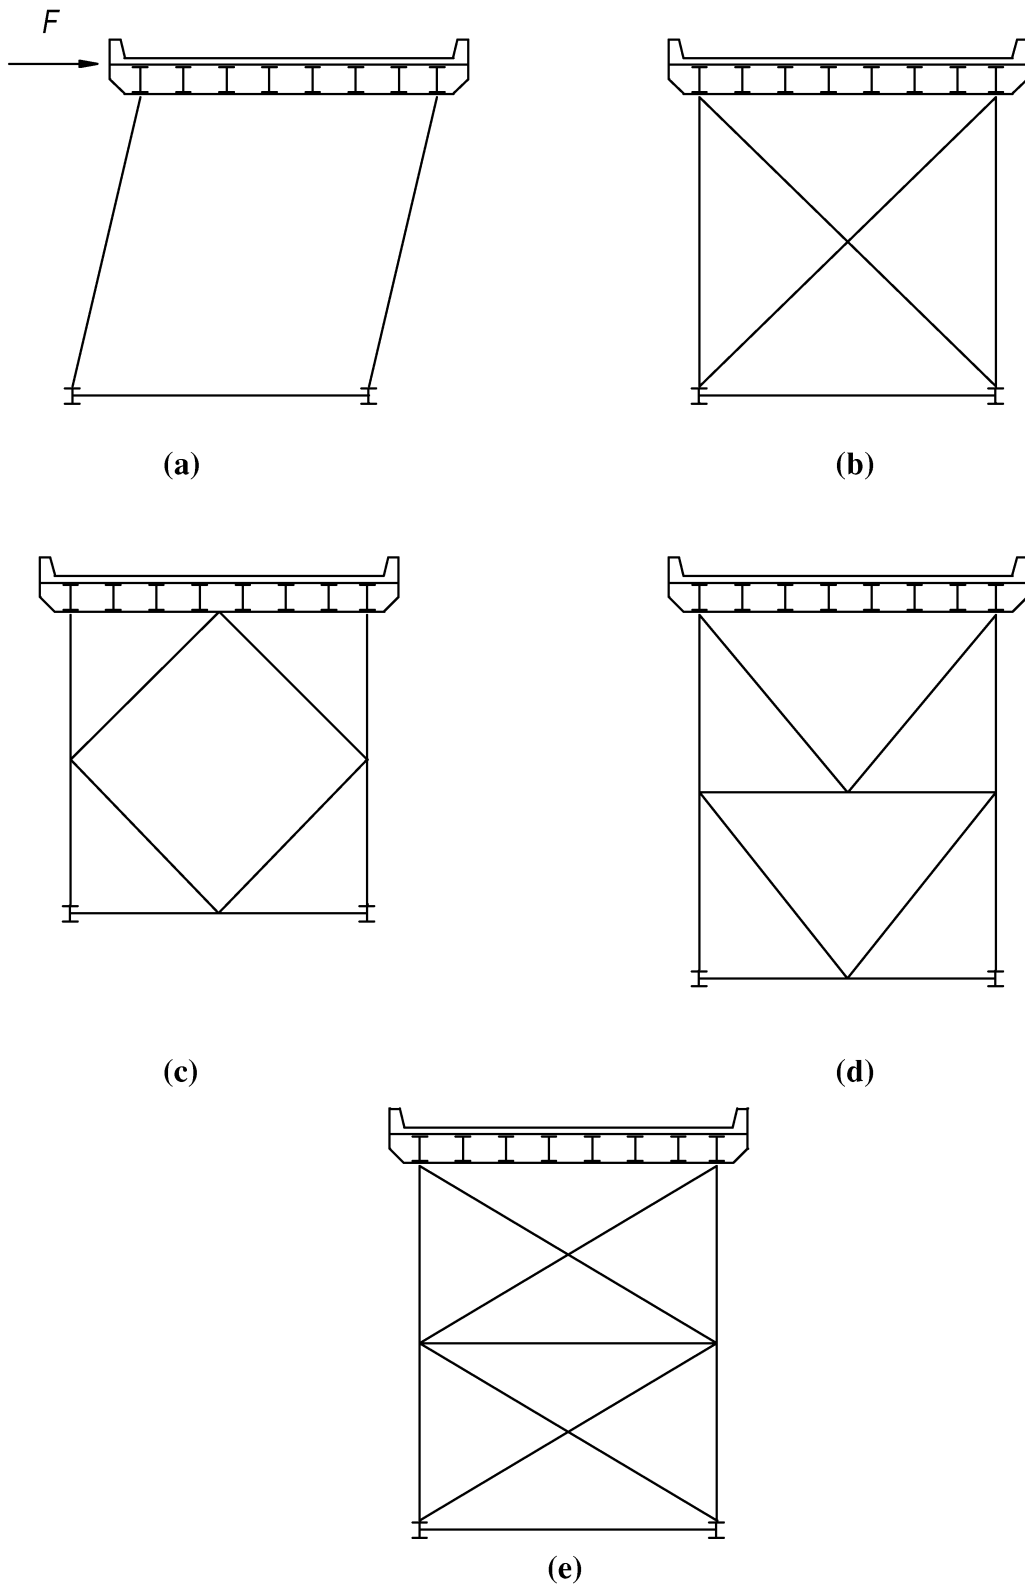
Typical Sway Frame and Bracing for Deck-Truss Bridges
